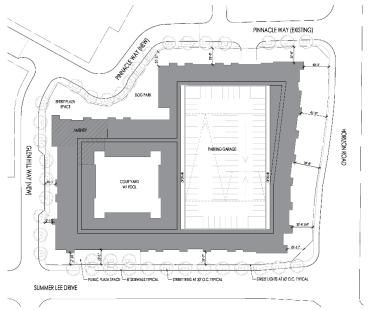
PROPOSED CONCEPT PLAN WITH REVISED BUILDING FOOTPRINT
